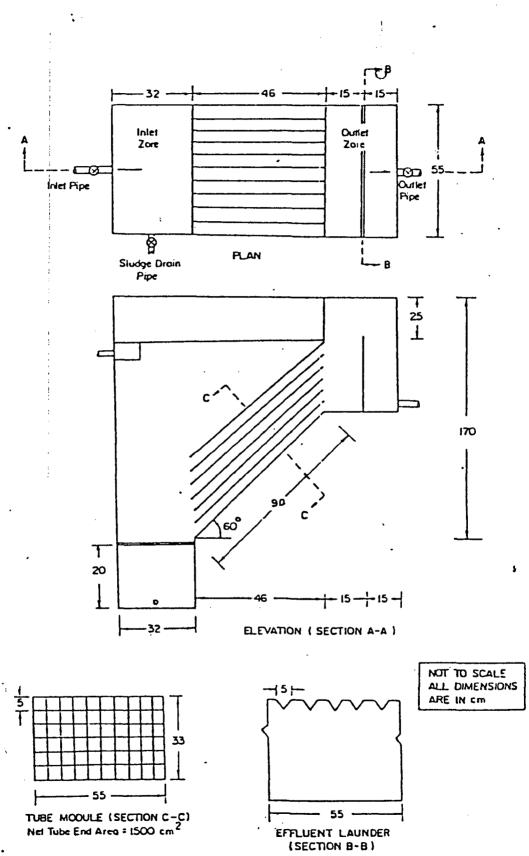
DETAILS OF INCLINED TUBE SETTLER.
